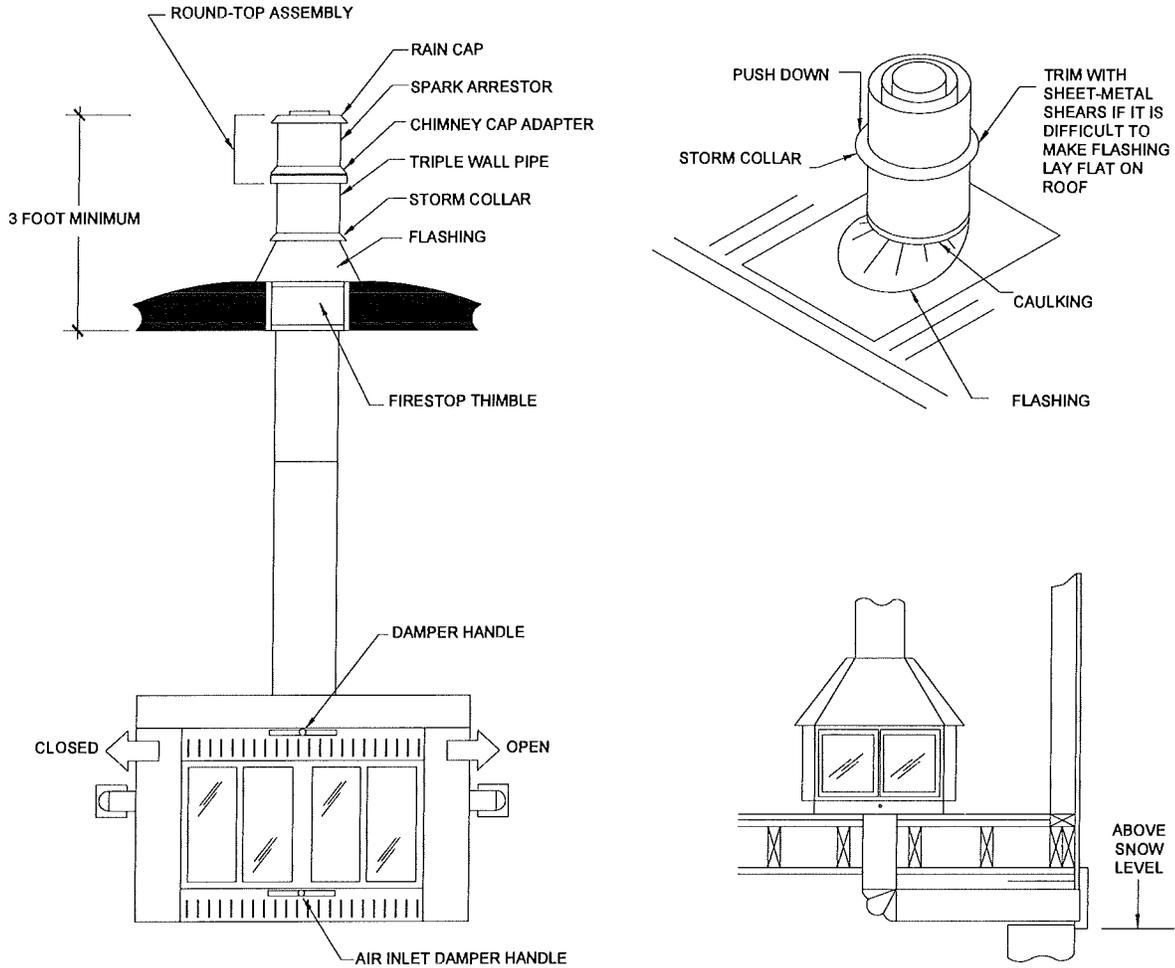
FIREPLACE CHIMNEY AND AIR INTAKE INSTALLATION
